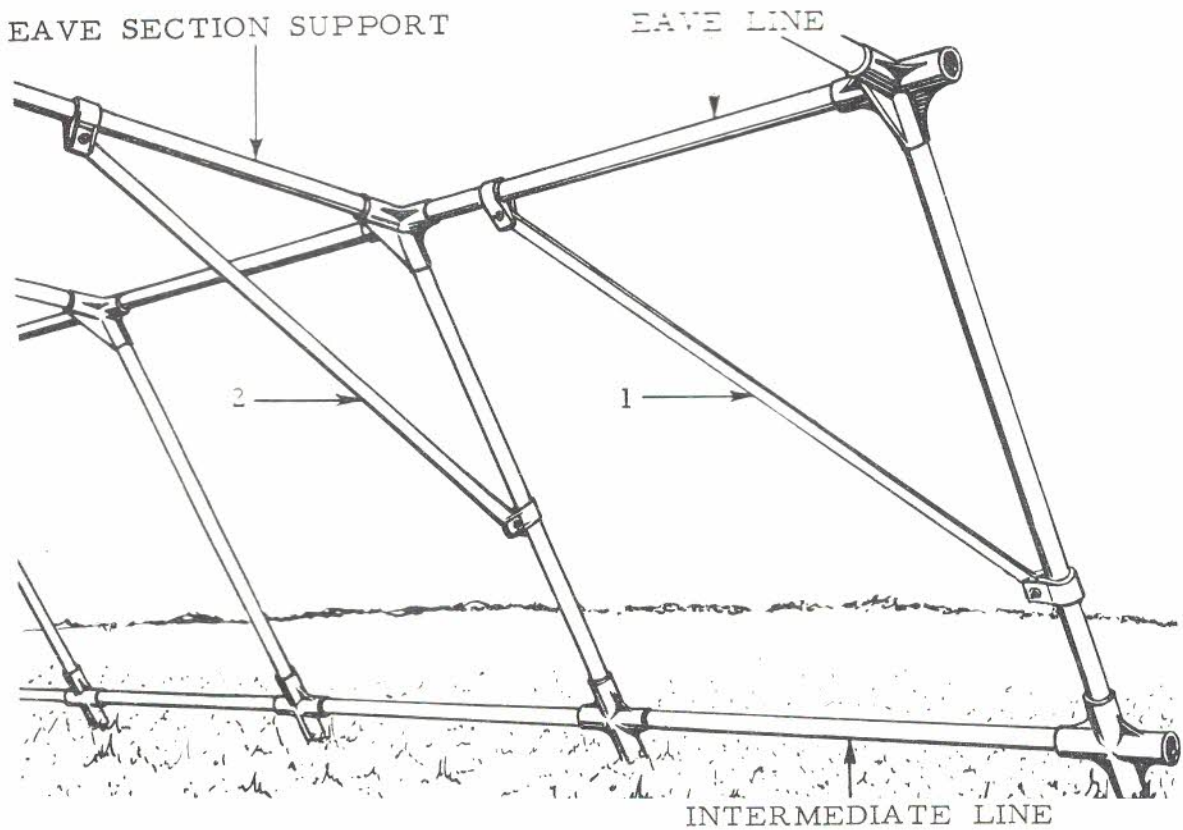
FLAT SUPPORTING BRACES FITTED TO UPPER WALL AND ROOF SUPPORTS
